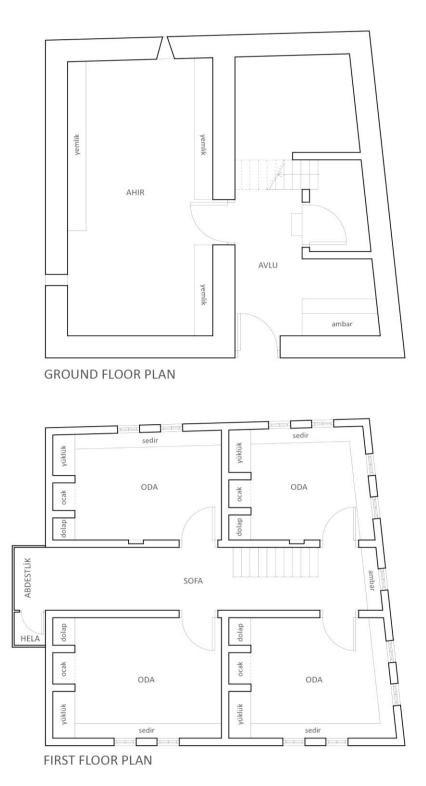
A traditional house plan with an inner *sofa* with two rooms on each side (*iki yüzlü iç sofalı plan tipi*)
